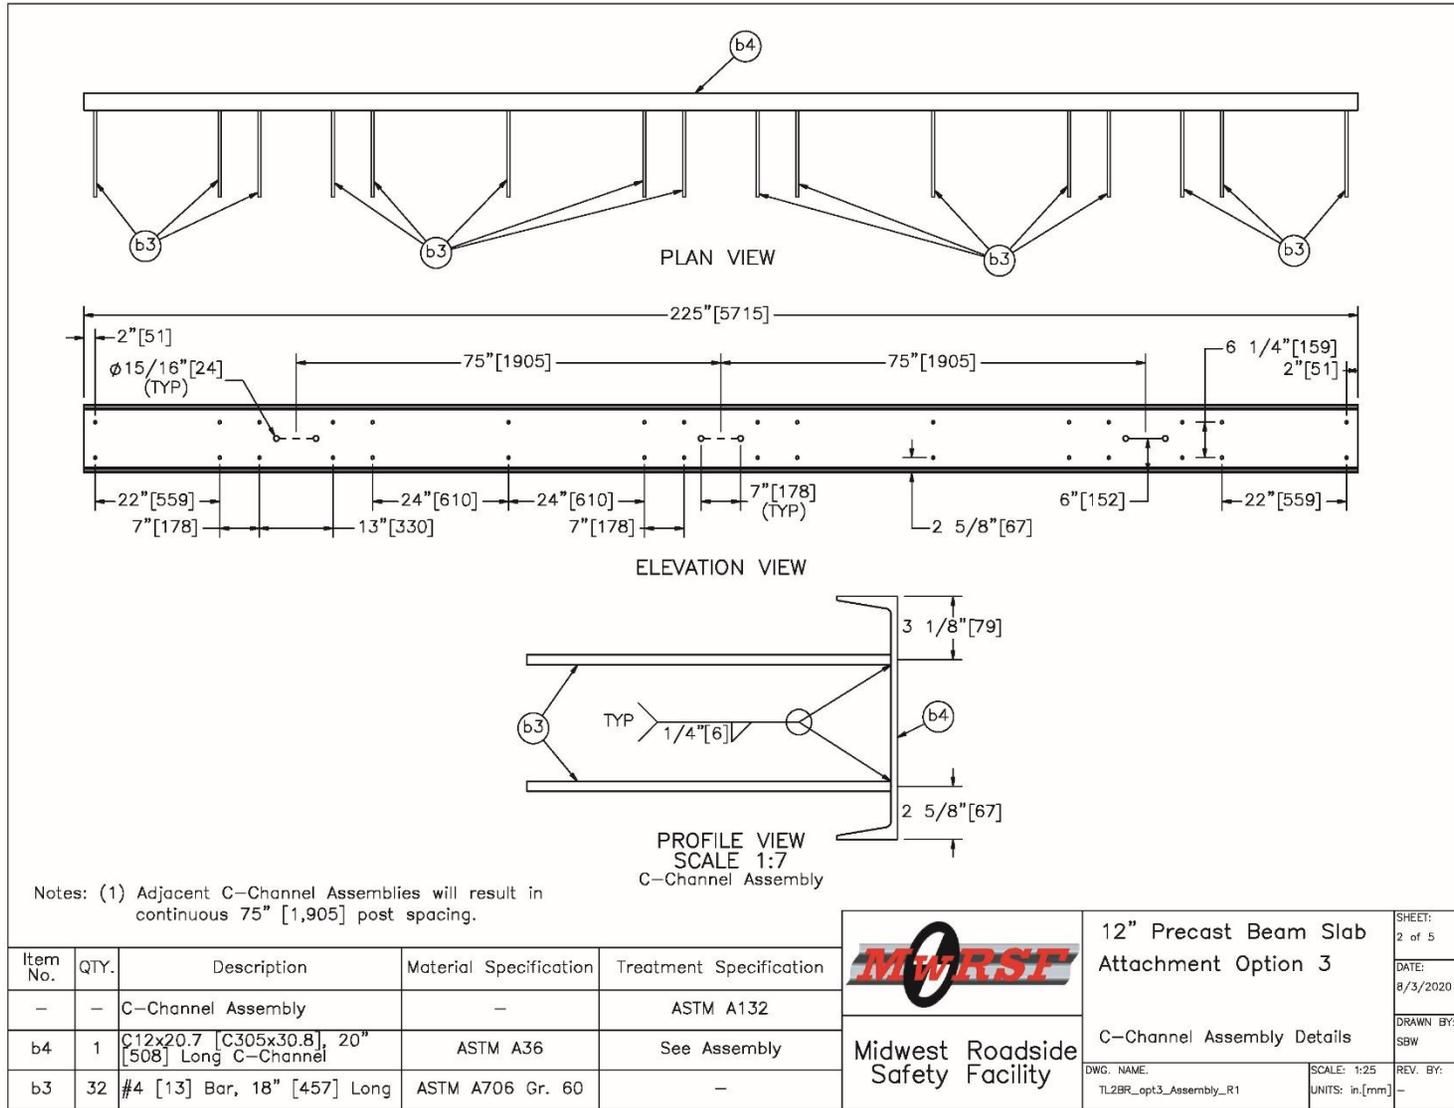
System Details, TL-2 Bridge Rail Attachment to 12-in. Deck, Option 3, Channel Assembly
